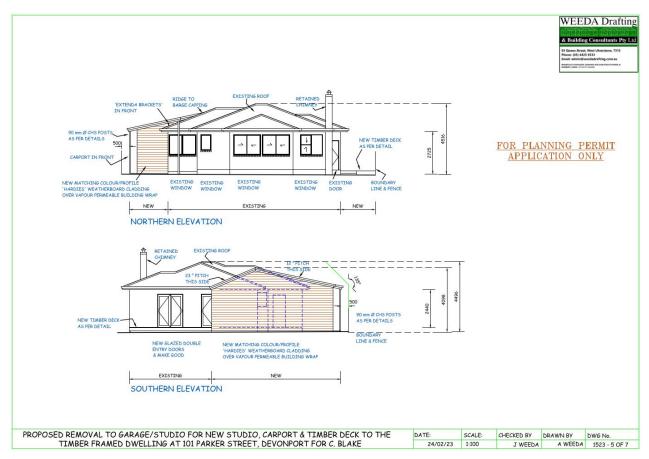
Elevations: 2 of 2 (Weeda Drafting)
